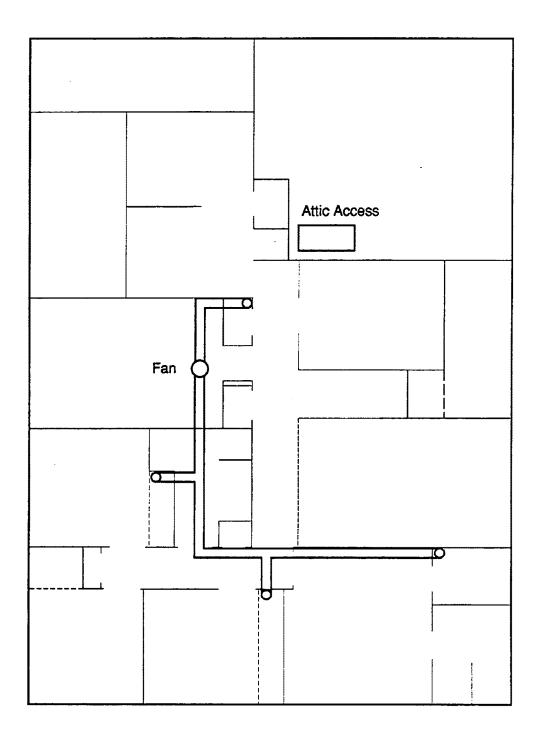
Sample attic piping layout for the house plan of Figure 1.
